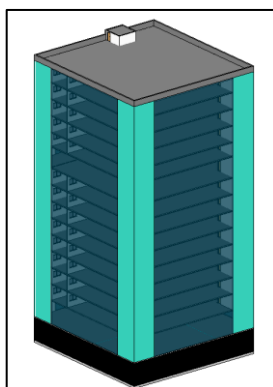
Building design model using Autodesk Revit: basement (black) and roof (gray)
